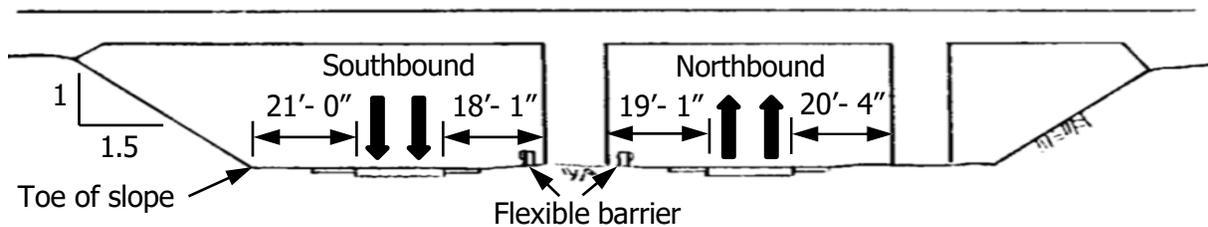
Bridge elevation view of horizontal clearances for separate southbound and northbound highway features below the bridge, with flexible barriers.
